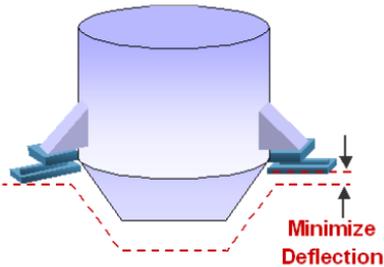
shows how a support beam can deflect when a weigh module is mounted at mid-span. If this type of arrangement cannot be avoided, you should reinforce the support beams to minimize deflection.
